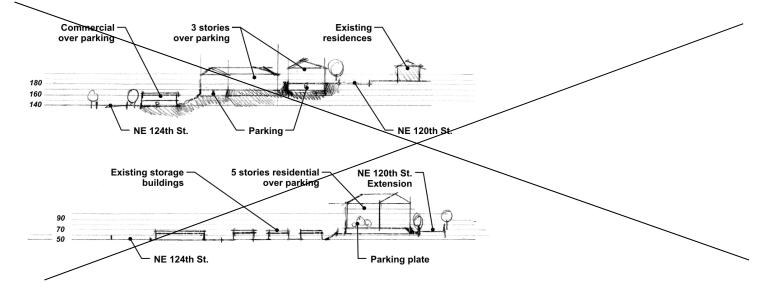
Redevelopment concept incorporating multi-family uses along Slater Avenue NE and planned NE 120th Avenue extension. Note how residential buildings are configured towards the street and around common open spaces. The section drawings above illustrate how development can take advantage of slopes.
